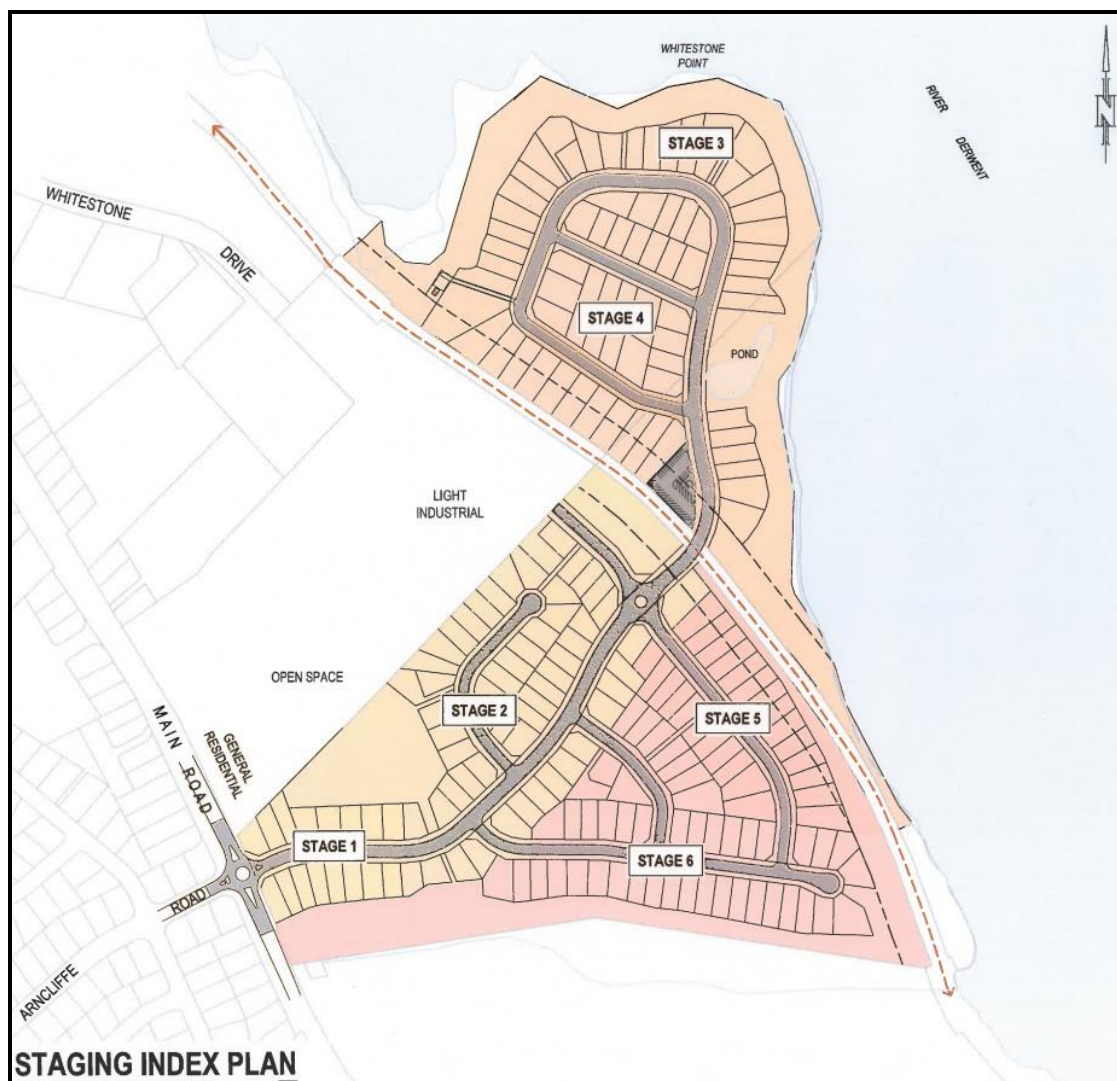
The staging plan of the proposal, showing the six stages and the proposed road network for the subdivision.
